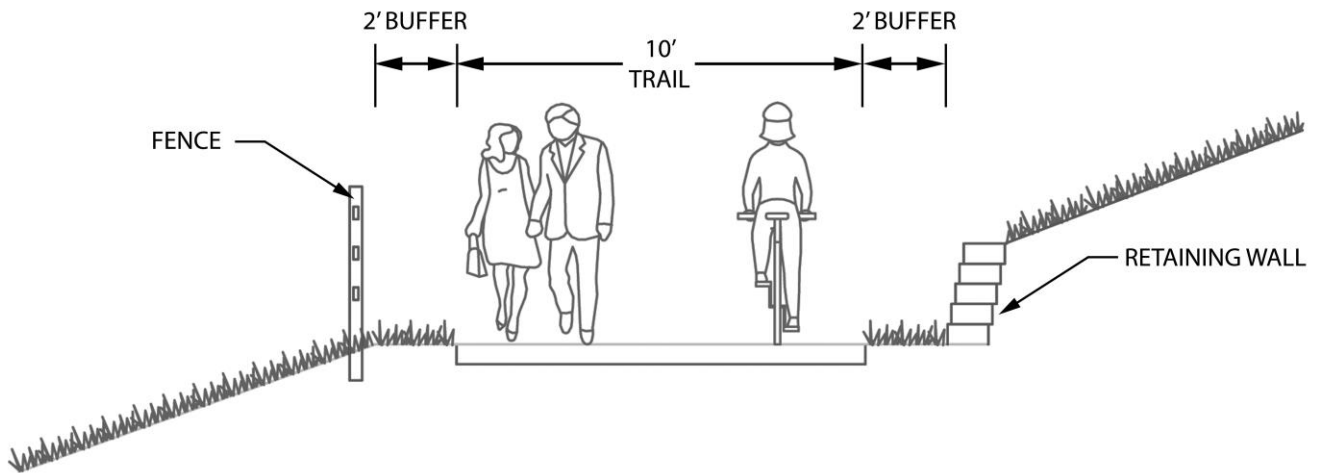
Typical Old Cameron Run Cross Section in cut condition with Retaining Wall
